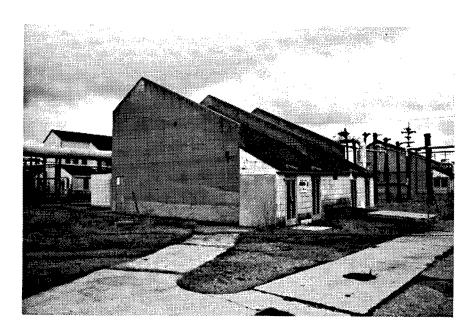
Building 4510-2: Block Press House that has reinforced concrete walls dividing the building into three areas.
